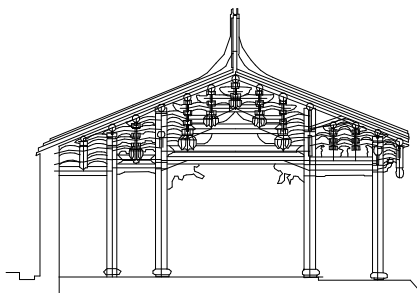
Schematic illustration of a Dieh-Dou timber frame and Dou-Gon joint
